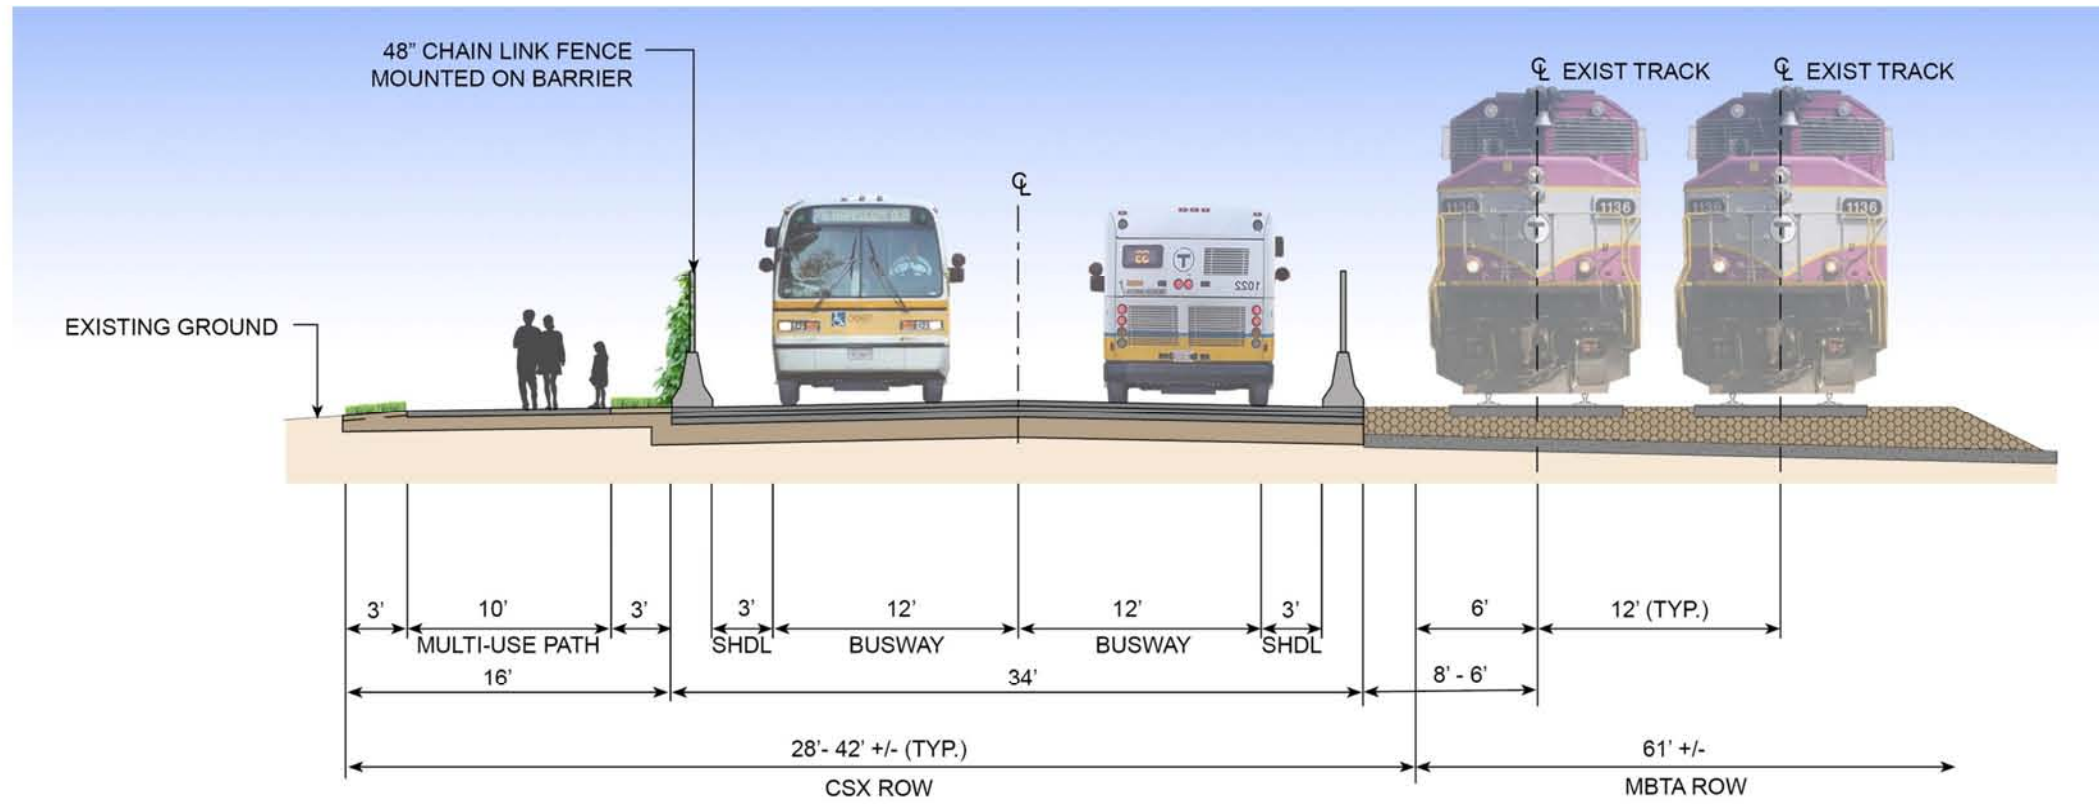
Multi-Modal Facility – Typical Section (Broadway to Everett Border)
